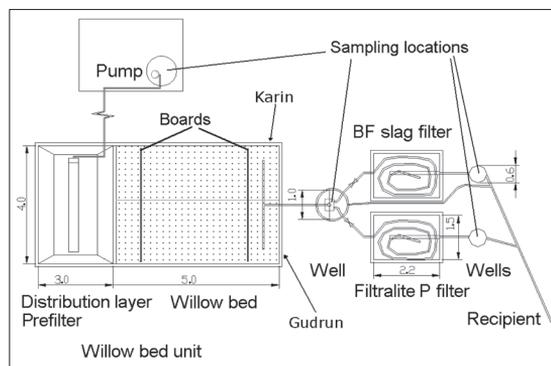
Layout of the experimental wastewater treatment plant. Units are given in m.
